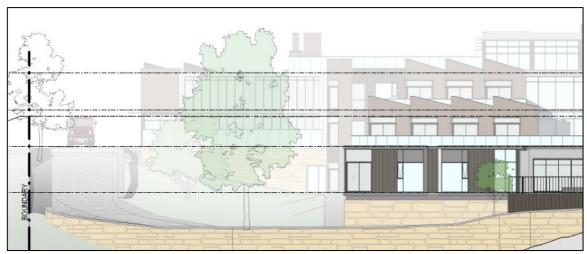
Stamped Plans – East Elevation Source: Morrison Design Partnership Pty Ltd
